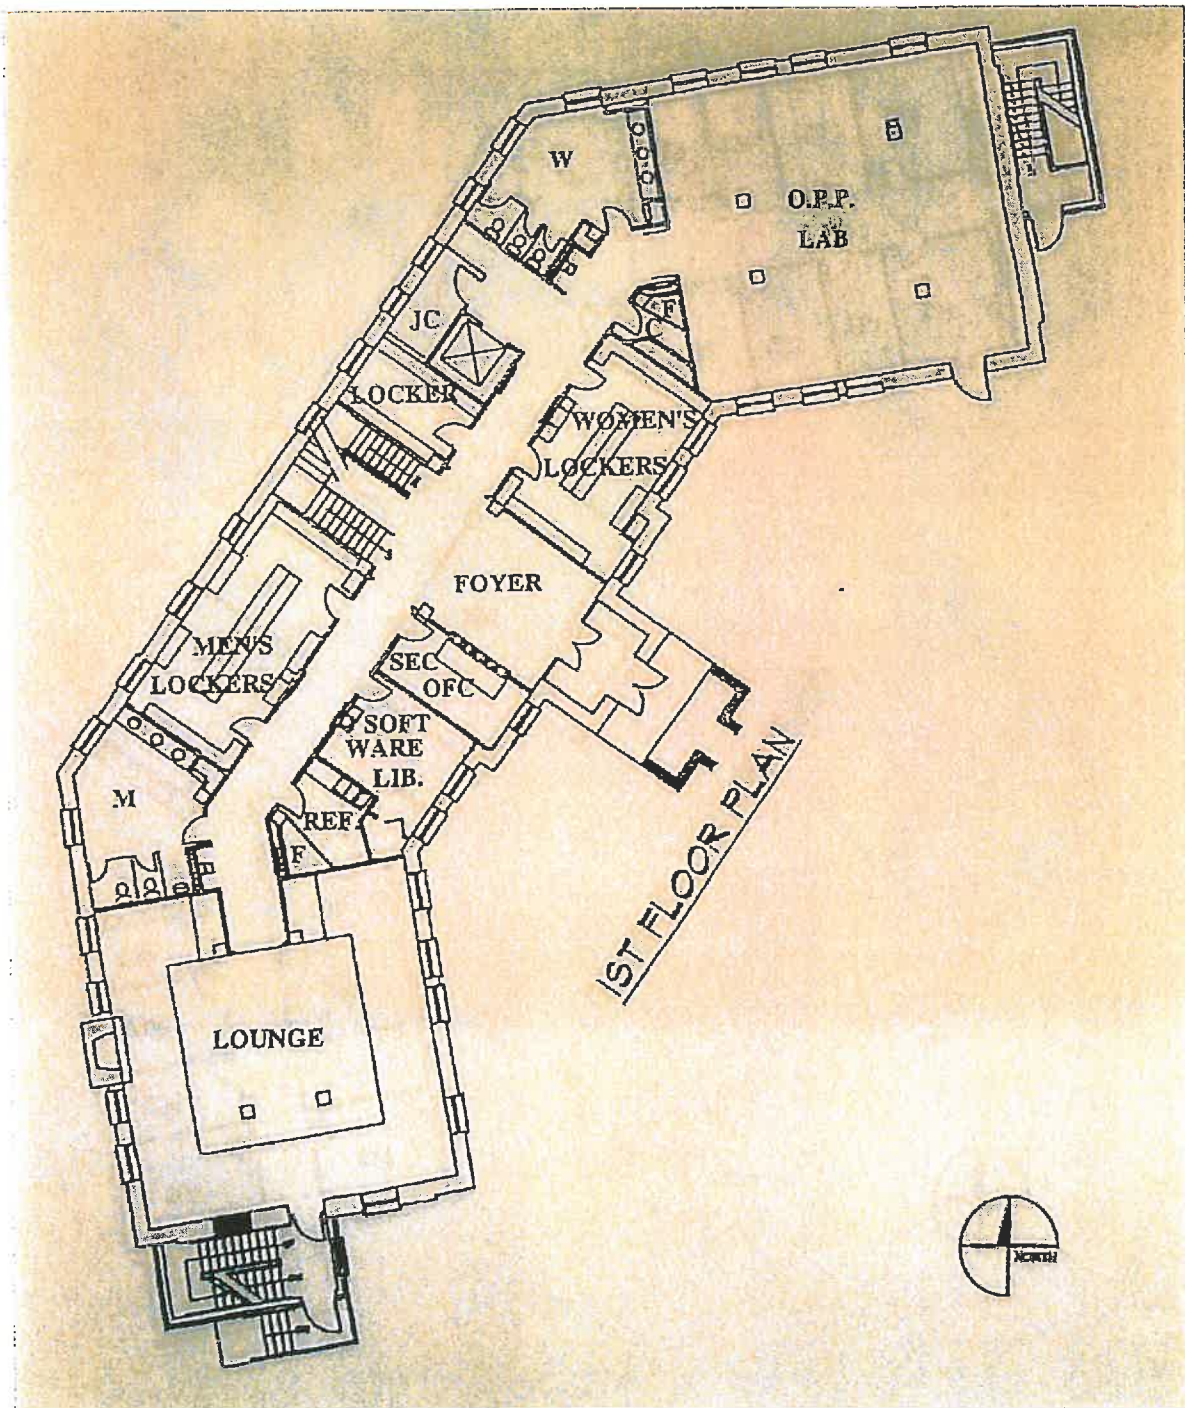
Current first floor plan (classroom in lounge not shown). Plan from KCU Archives.
